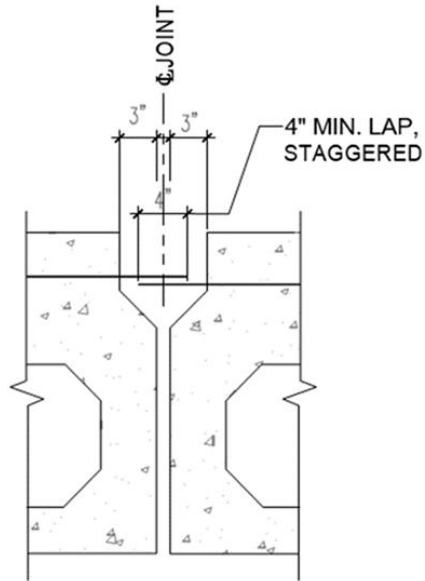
NMDOT box girder joint lap splice cross section (UHPC Phase IV, Figure 5.4)
